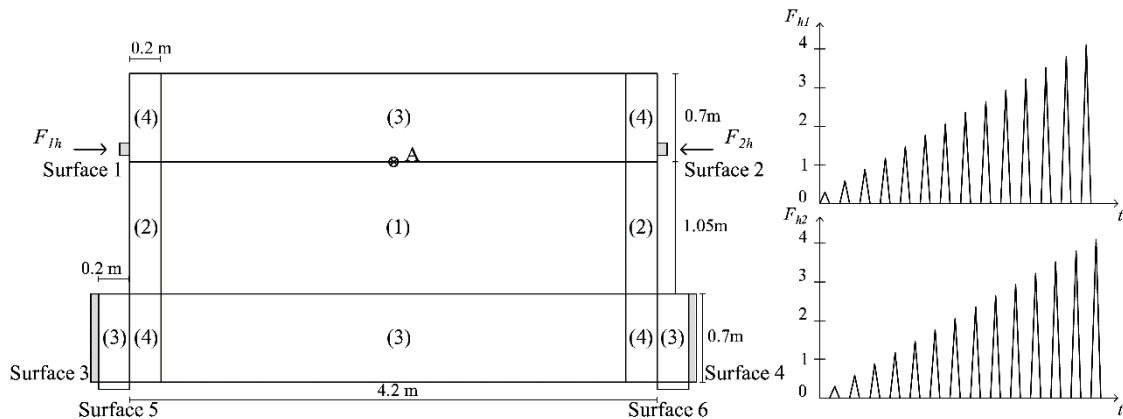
Geometry, boundary and loading conditions for the masonry shear wall.
